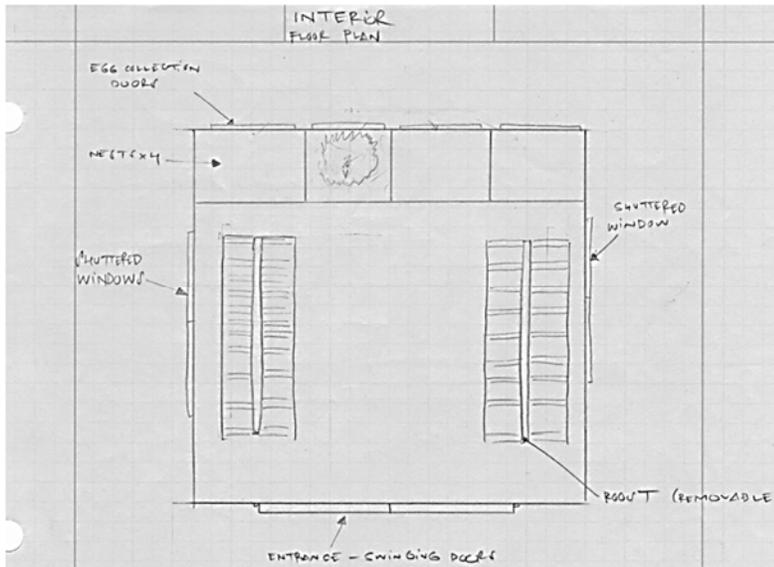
Floor Plan drawn by Seth Ehret on 10/14/2014
